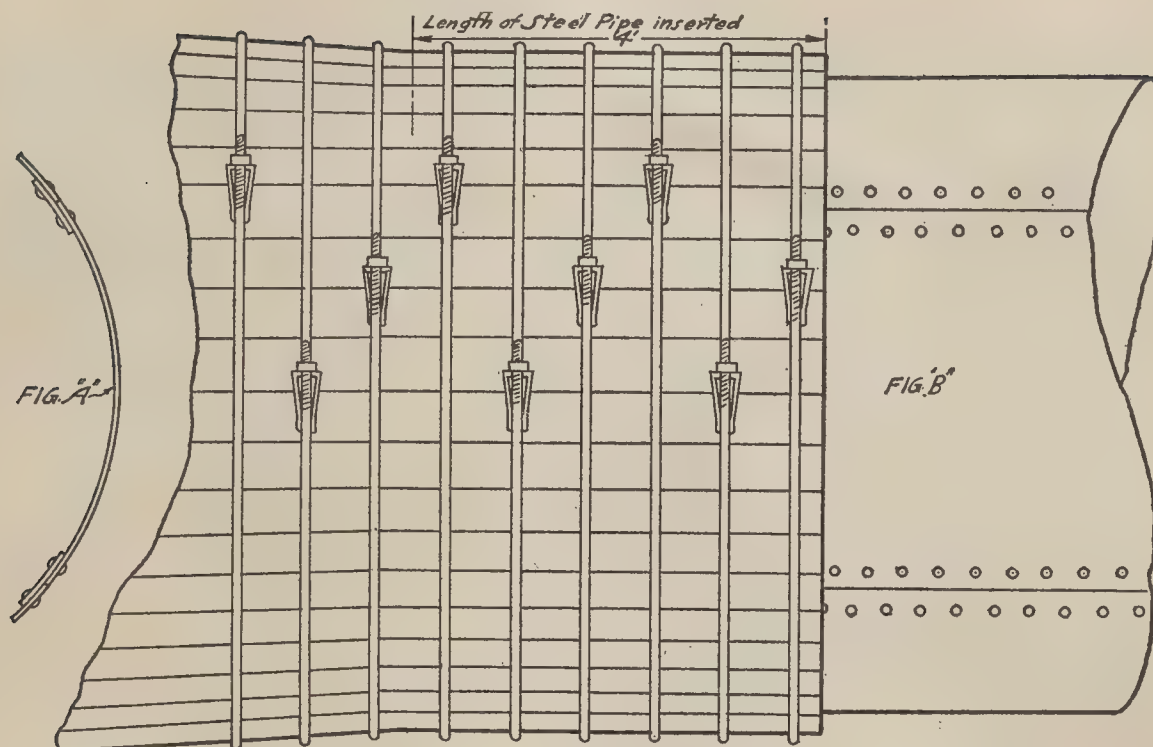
DETAIL OF CONNECTION OF 8-FT. WOOD STAVE TO 6-FT. STEEL PIPE—PACIFIC GAS & ELECTRIC COMPANY.
